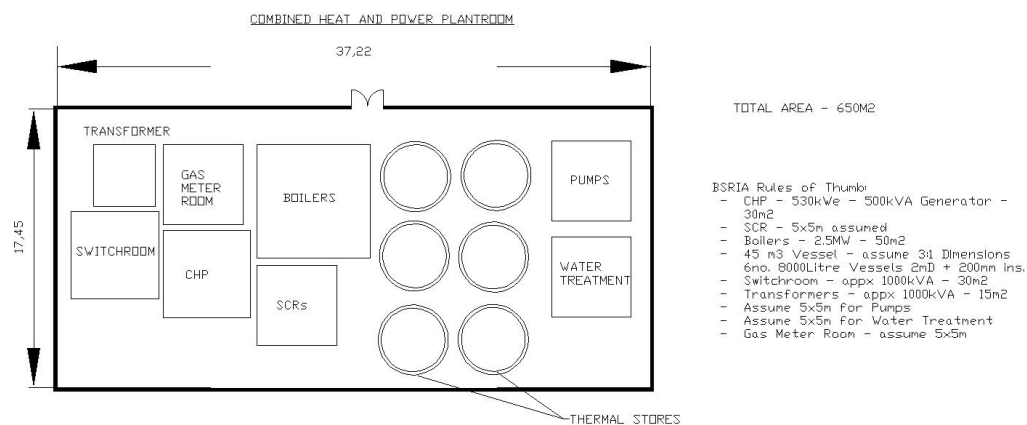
Typical CHP Energy Centre/ Plant room requirements
